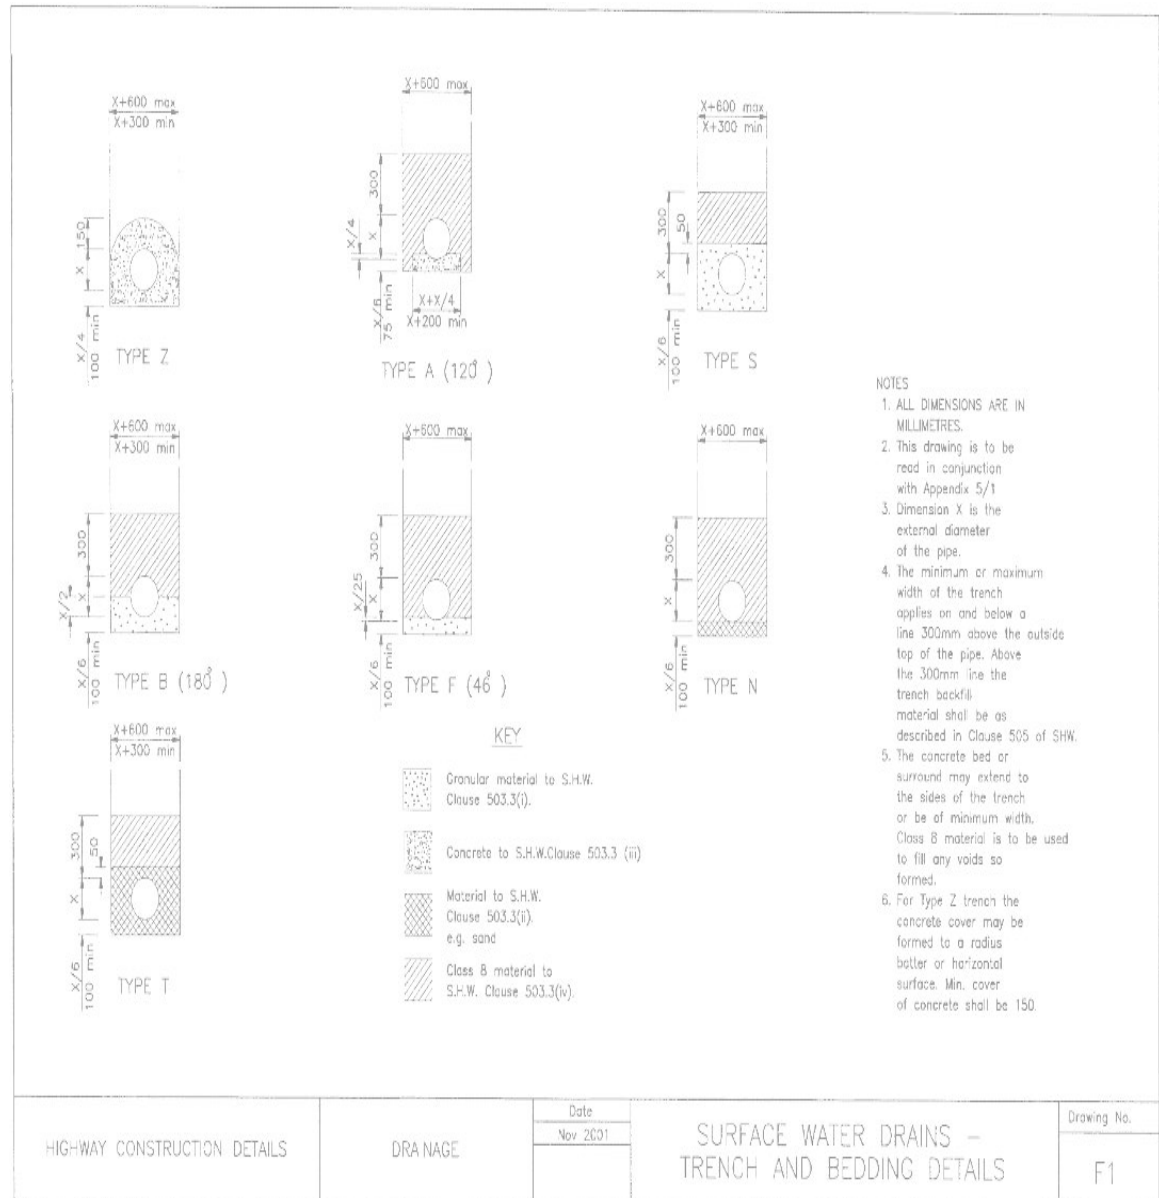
Conventional Piped Drainage (Source: DMRB)
